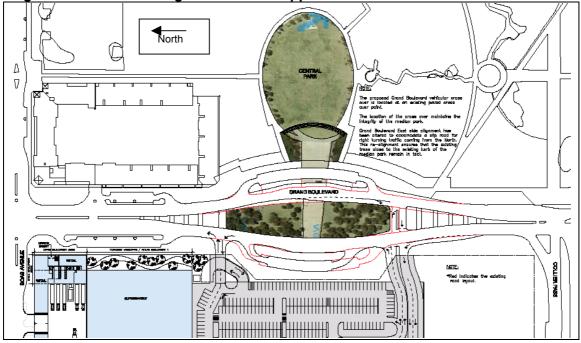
Access Arrangements to the Upper Deck Car Park off Grand Boulevard
